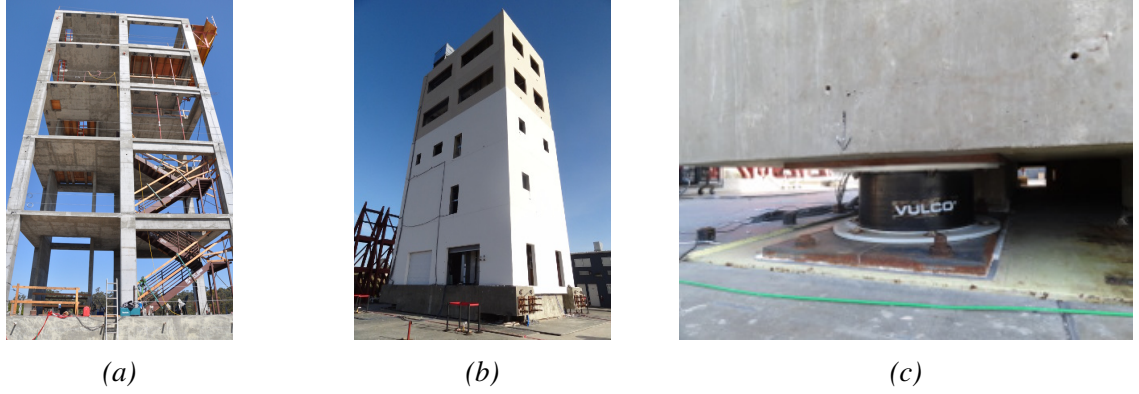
a) Bare structural frame before installation of non-structural components b) Building equipped with the facade c) Base isolator detail. Pictures taken from [191]
